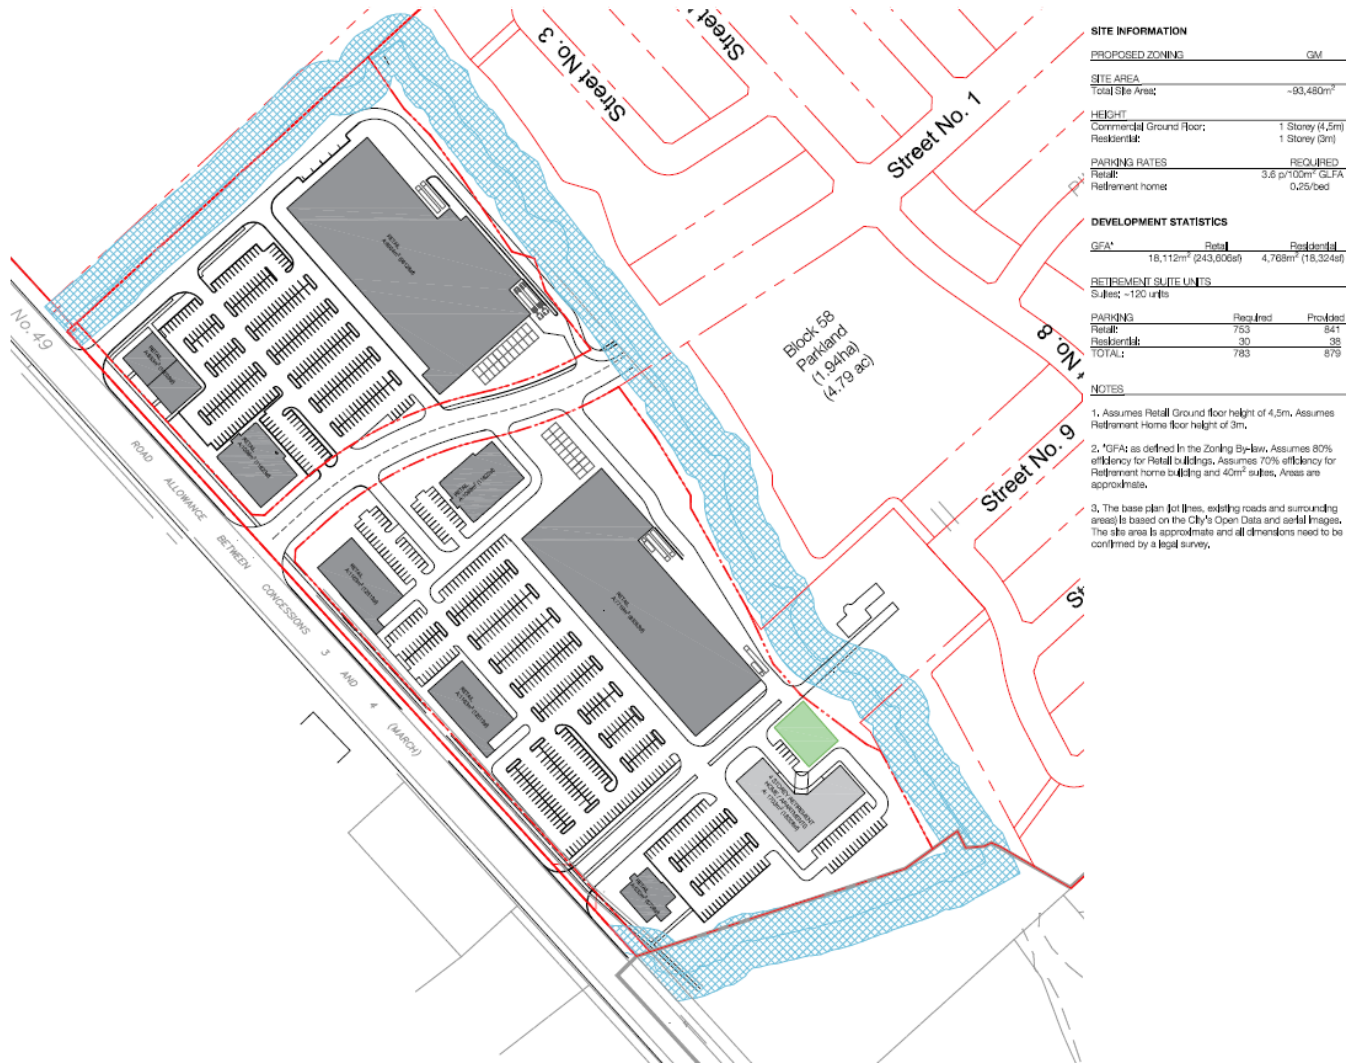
Alternate Concept Plan for the Metcalfe Lands
